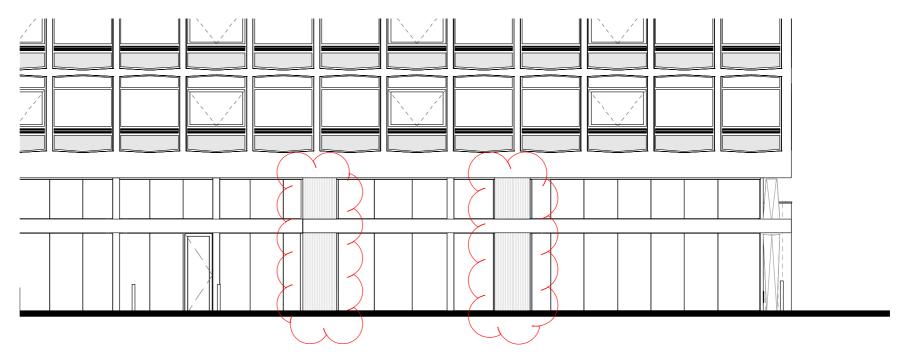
Consented East Elevation - Existing Concrete Piers Location
